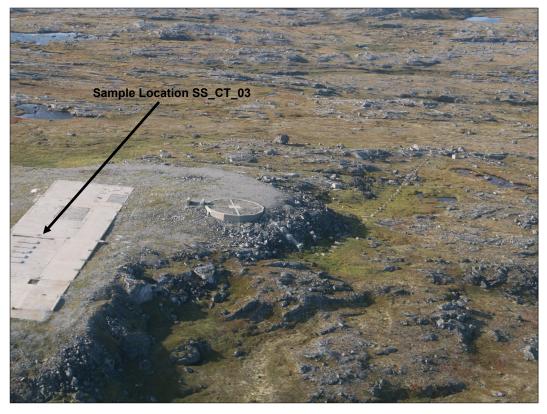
APEC #10: Aerial view of main building and radiomen foundations. (September, 2017)
